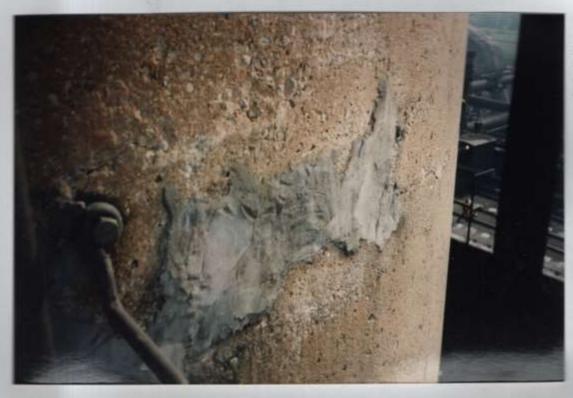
Cement patch at 75' above grade elevation, right of step irons.
